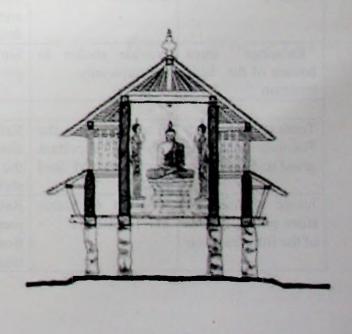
Plan and Section of image house on stone pillars at Hulugalla
